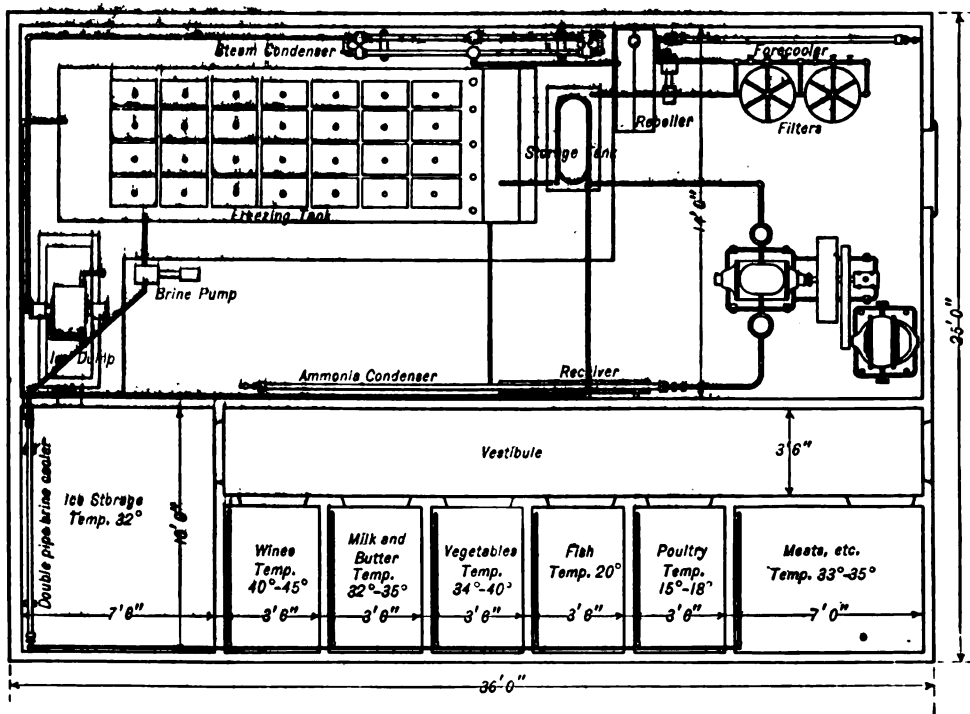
PLAN OF HOTEL REFRIGERATING PLANT.
